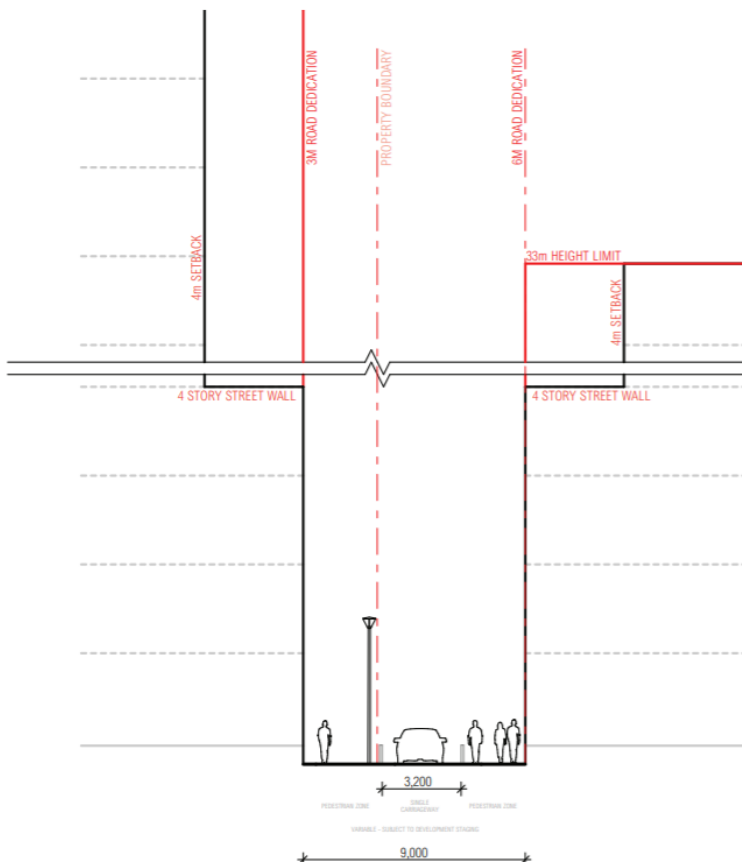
Indicative street section – Ashmore Connector East, North Alexandria
